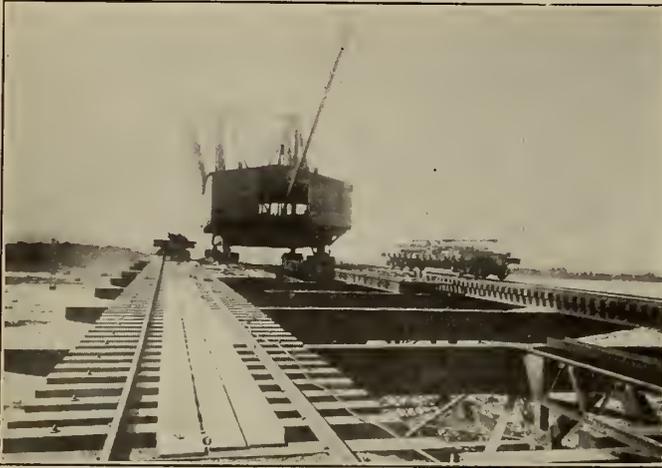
South Approach—Rear View of Traveller No. 1 and Deck.
